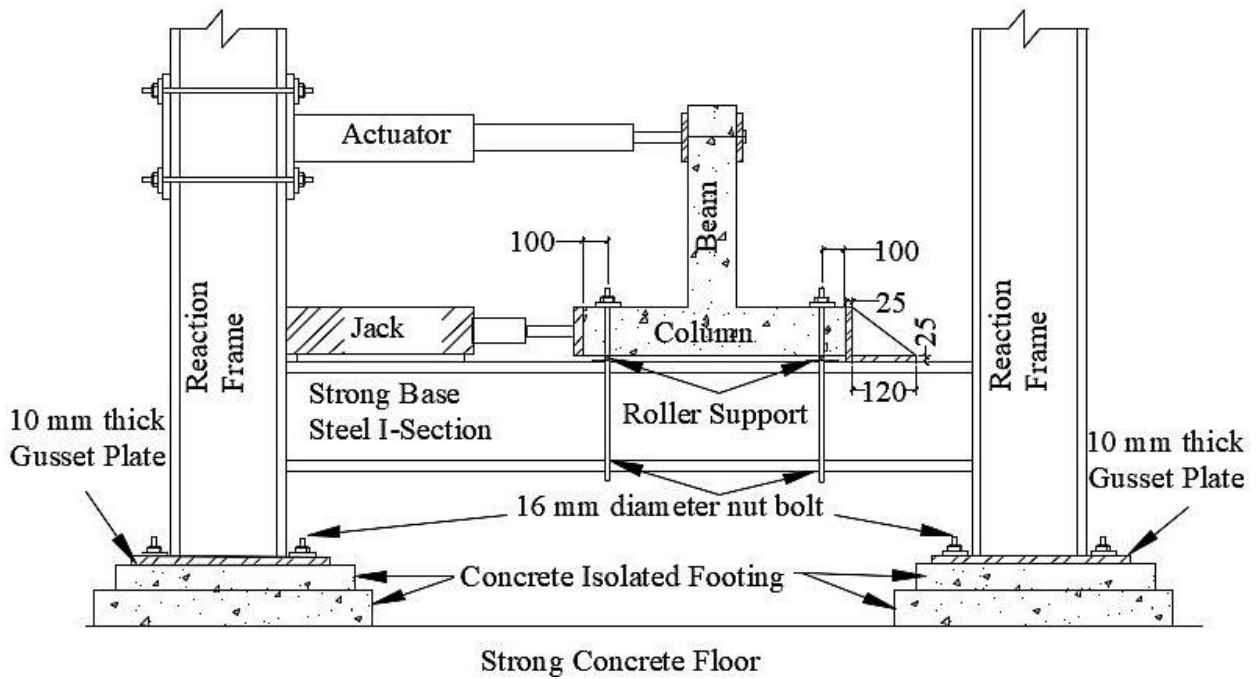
Detail of Experimental Setup and Geometric Dimensions of the Beam Column Joint
